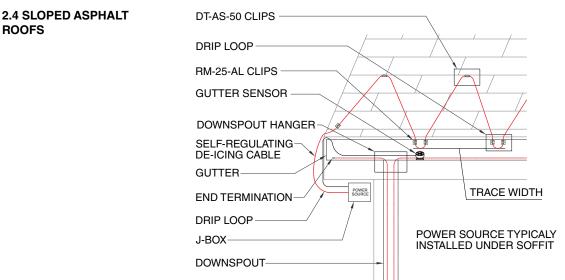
De-icing cable should extend 6" above exterior wall on sloped roofs.
